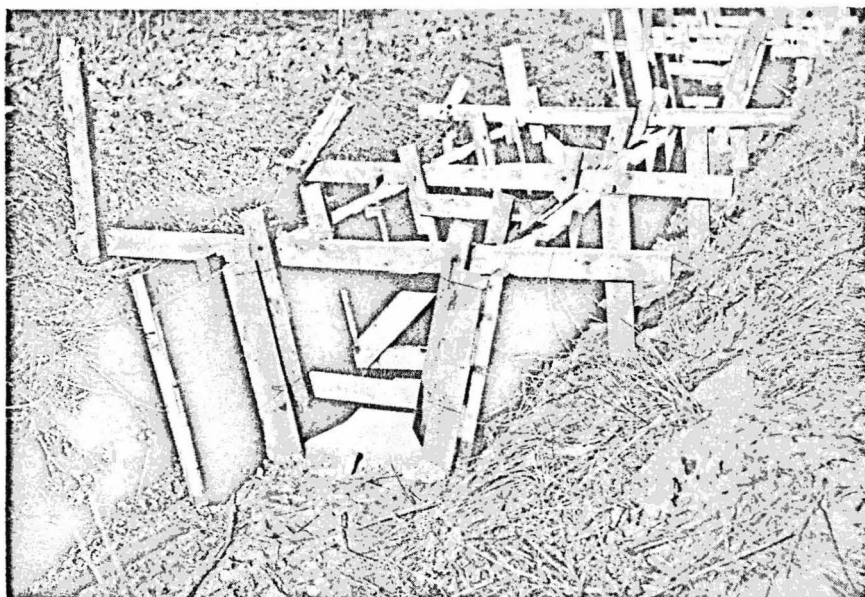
Use of both inside and outside forms for casting concrete ditch linings. The forms here are 16 feet long and are set up with 16-foot gaps to be filled in later.
